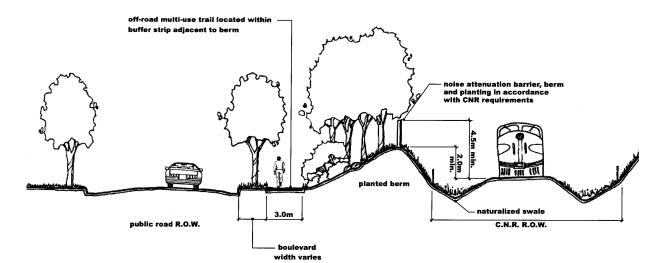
Typical cross section of a cycling facility adjacent to a rail corridor separated by a planted berm.
